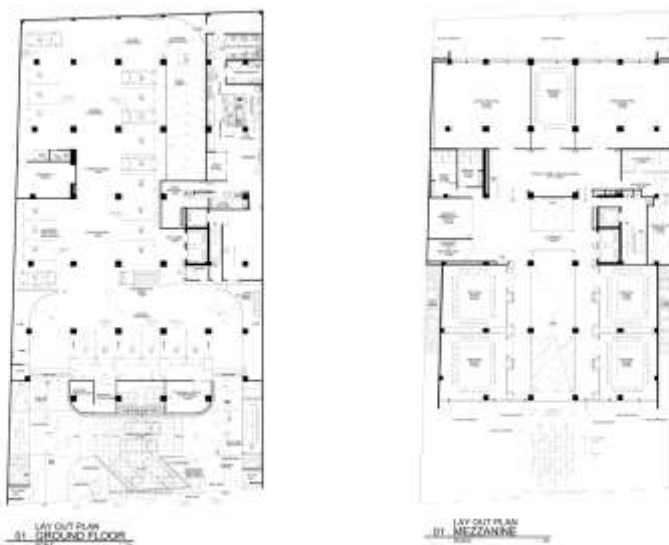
Ground floor plan and mezzanine floor plan of Akmani hotel
